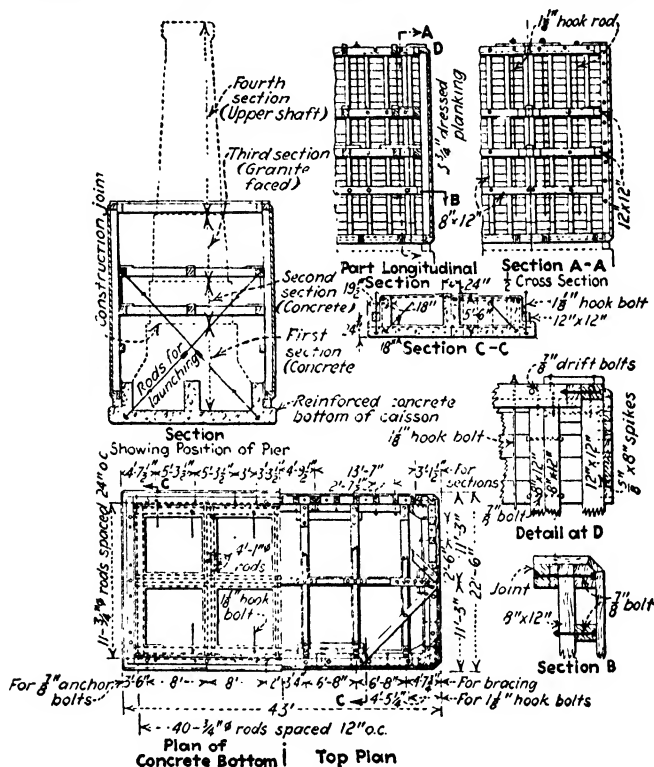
Movable Cofferdam with Concrete Base for Newark Bay Bridge of the Central Railroad of New Jersey.
